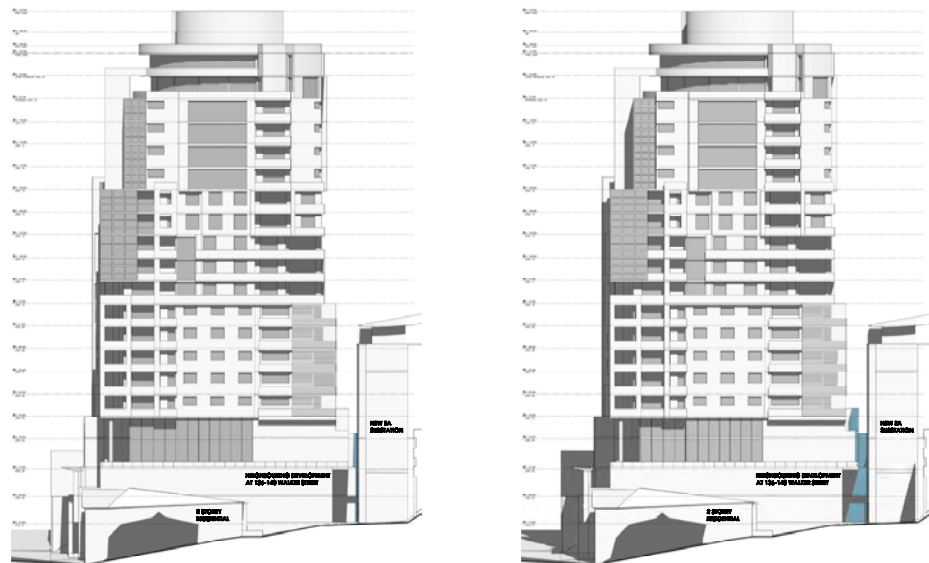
Shadow diagrams for the Winter Solstice, northern elevation of the proposed development at
